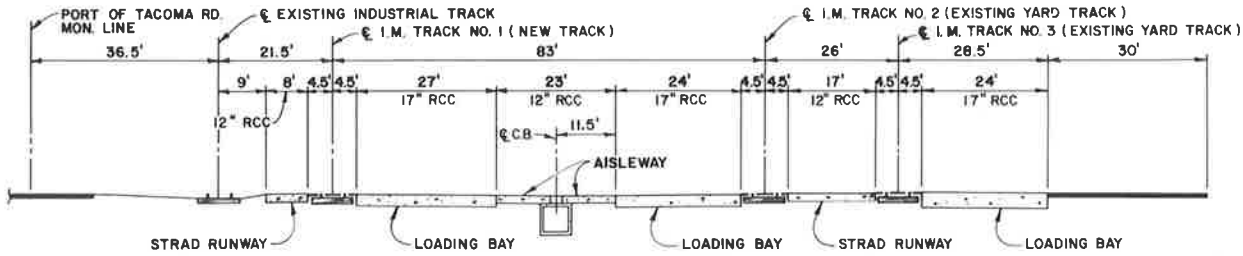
Typical yard section—North Intermodal Rail Yard.
